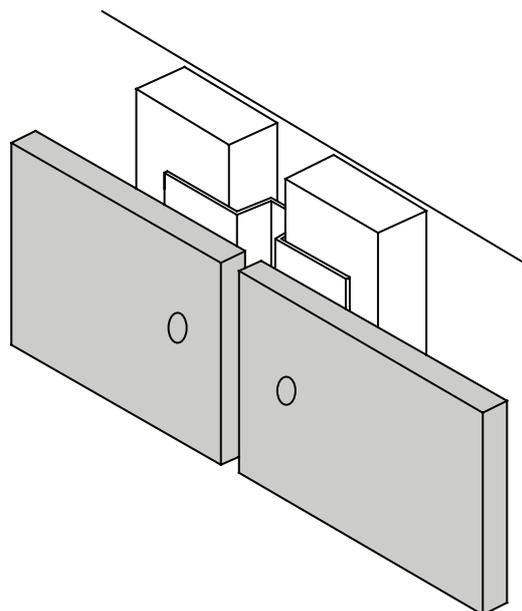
Open vertical joint with preformed metal 'top hat' flashing
